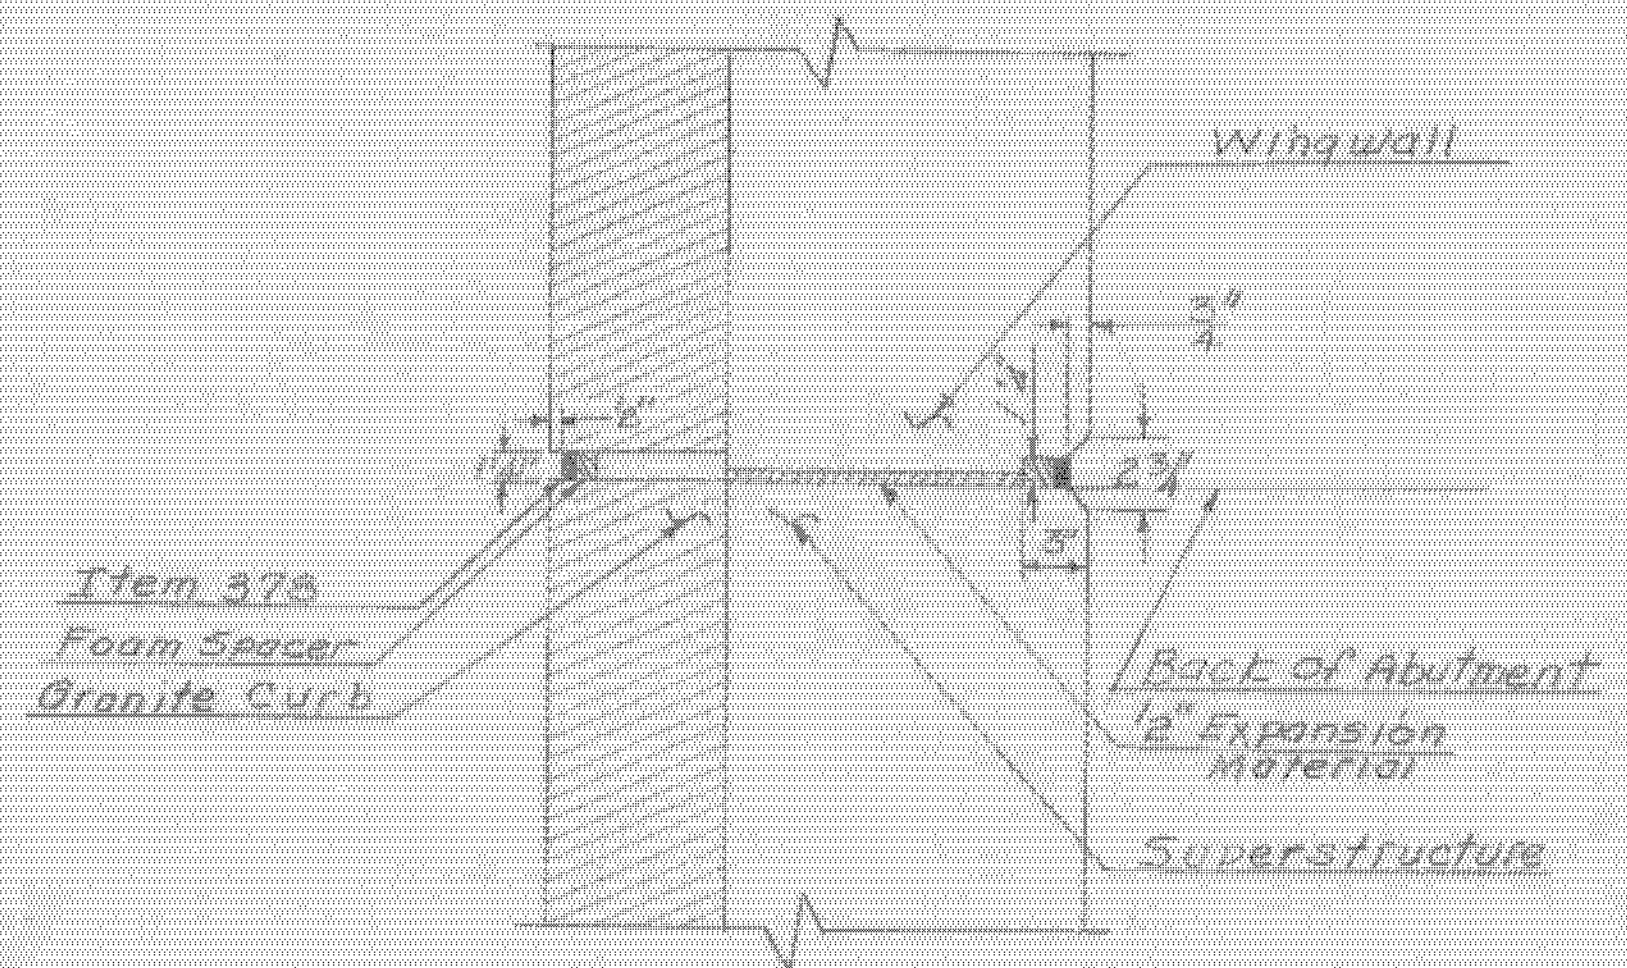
DETAIL OF BRIDGE SEAT TREATMENT - FIXED ABUTMENTS
